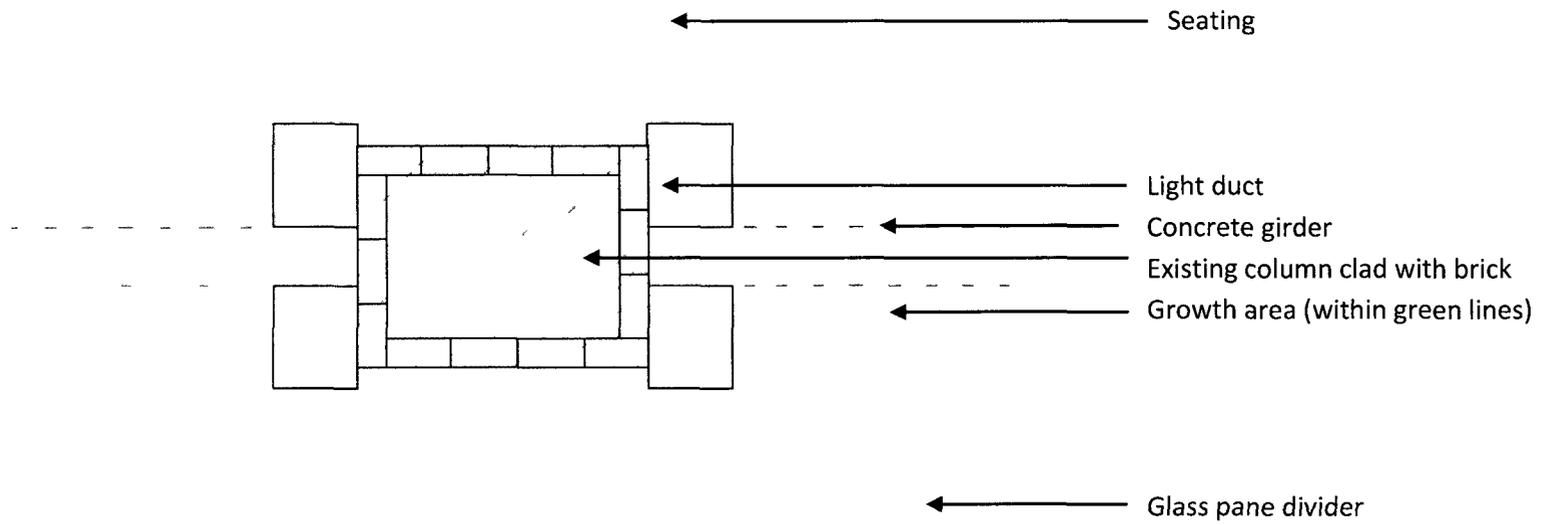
Plan view of a single column. There are four light ducts that anchor onto the existing brick clad column. The light is reflected outward towards the girders and then reflected once again towards the plants.
